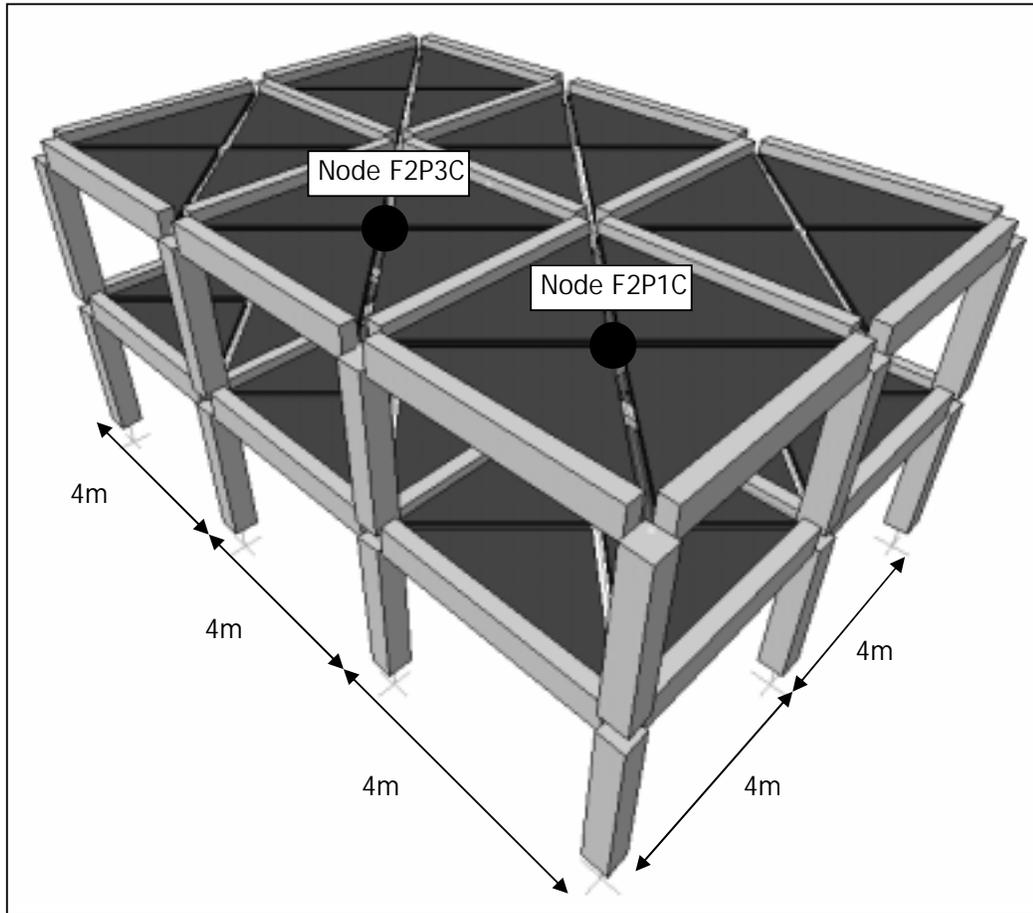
3D Model of the Test Building with Floor Plan dimensions
